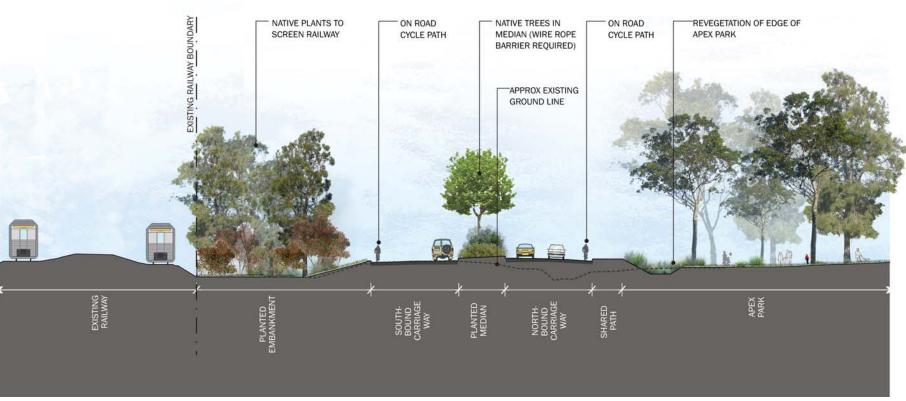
Proposed road cross section E at Ch. 1860 (Scale 1:400 @ A3)
